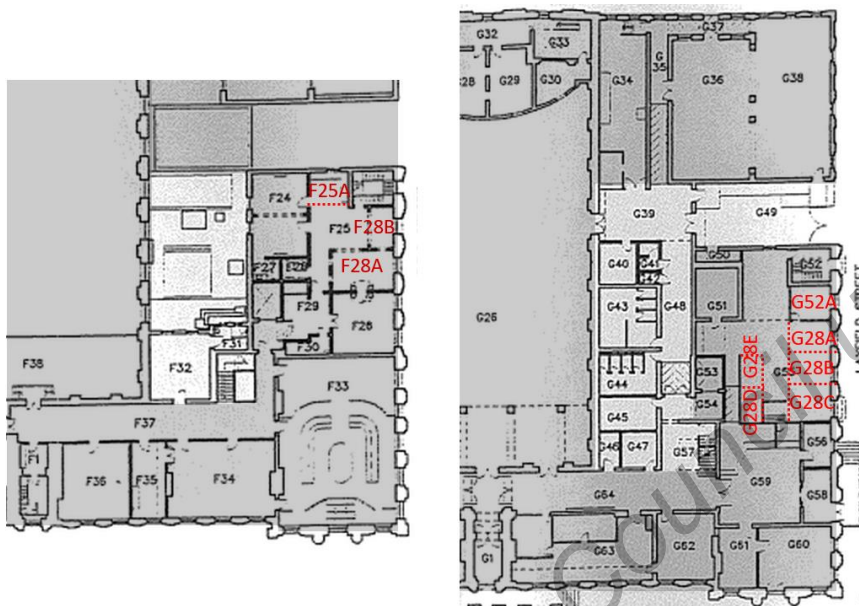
ANAM Buildings (East Annex) site arrangement (Ground floor – right; First floor – left).
